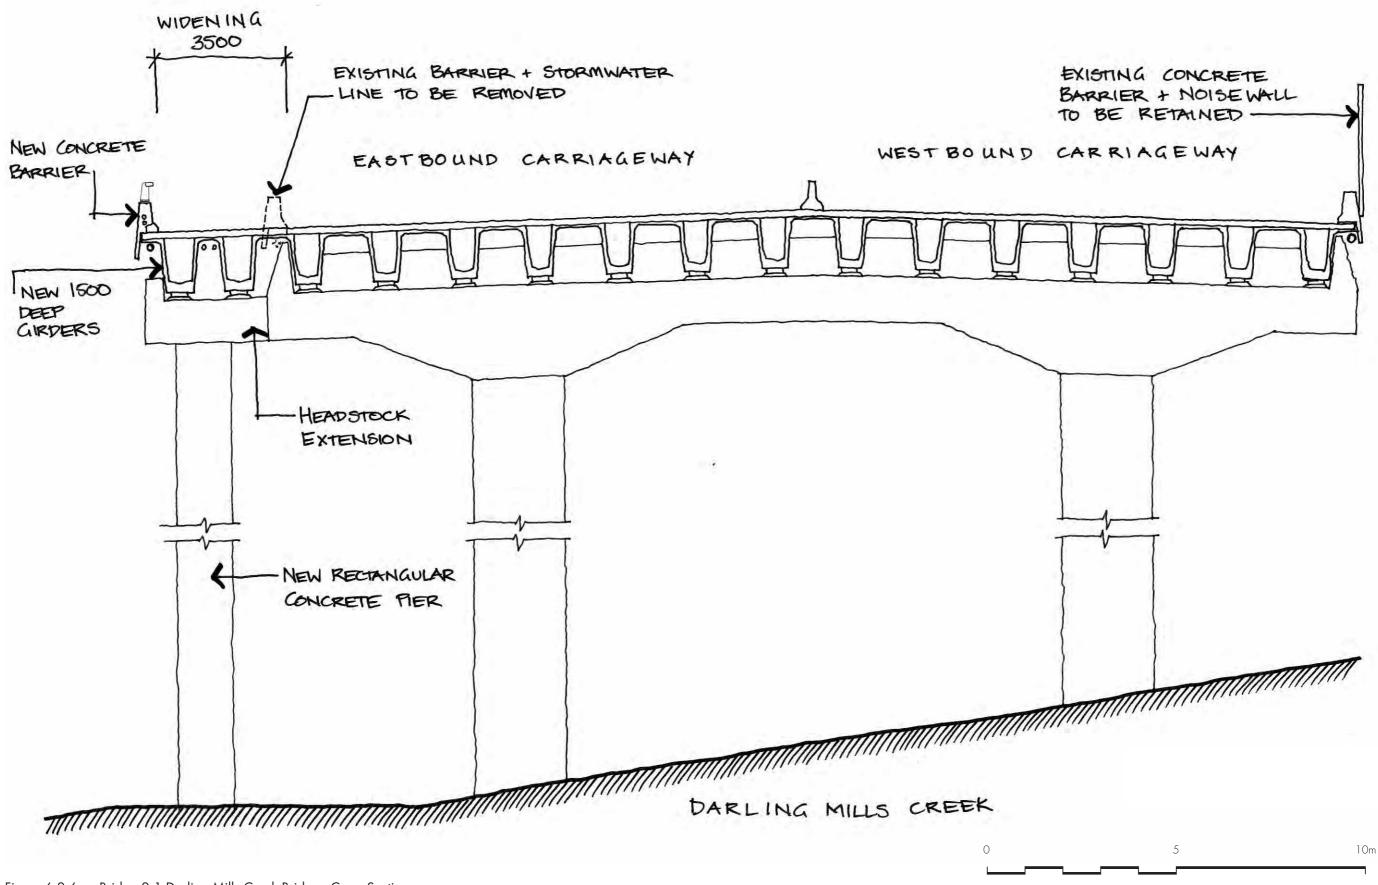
Bridge 2.1 Darling Mills Creek Bridge - Cross Section
